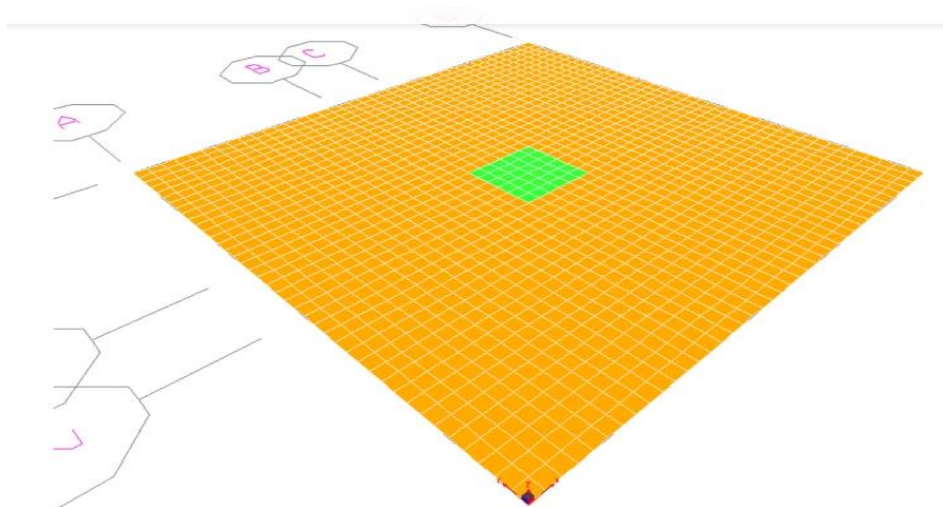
3D view of stone column loading as uniformly distributed load (UDL) on footing
